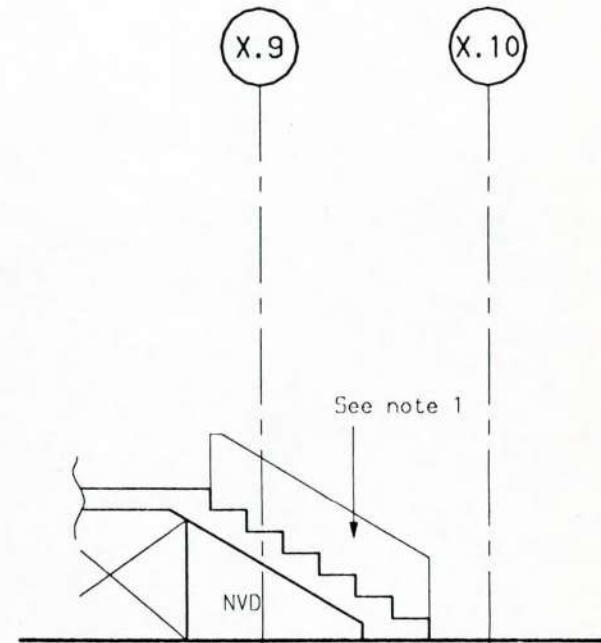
STAIRCASE WALLS D, E & F, EXTERNAL ELEVATIONS
